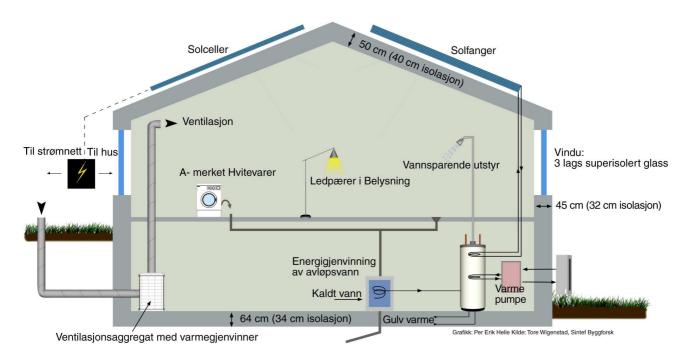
System of technical equipment (symbolic only; cm insulation not as built) Illustration: Stavanger Aftenblad
